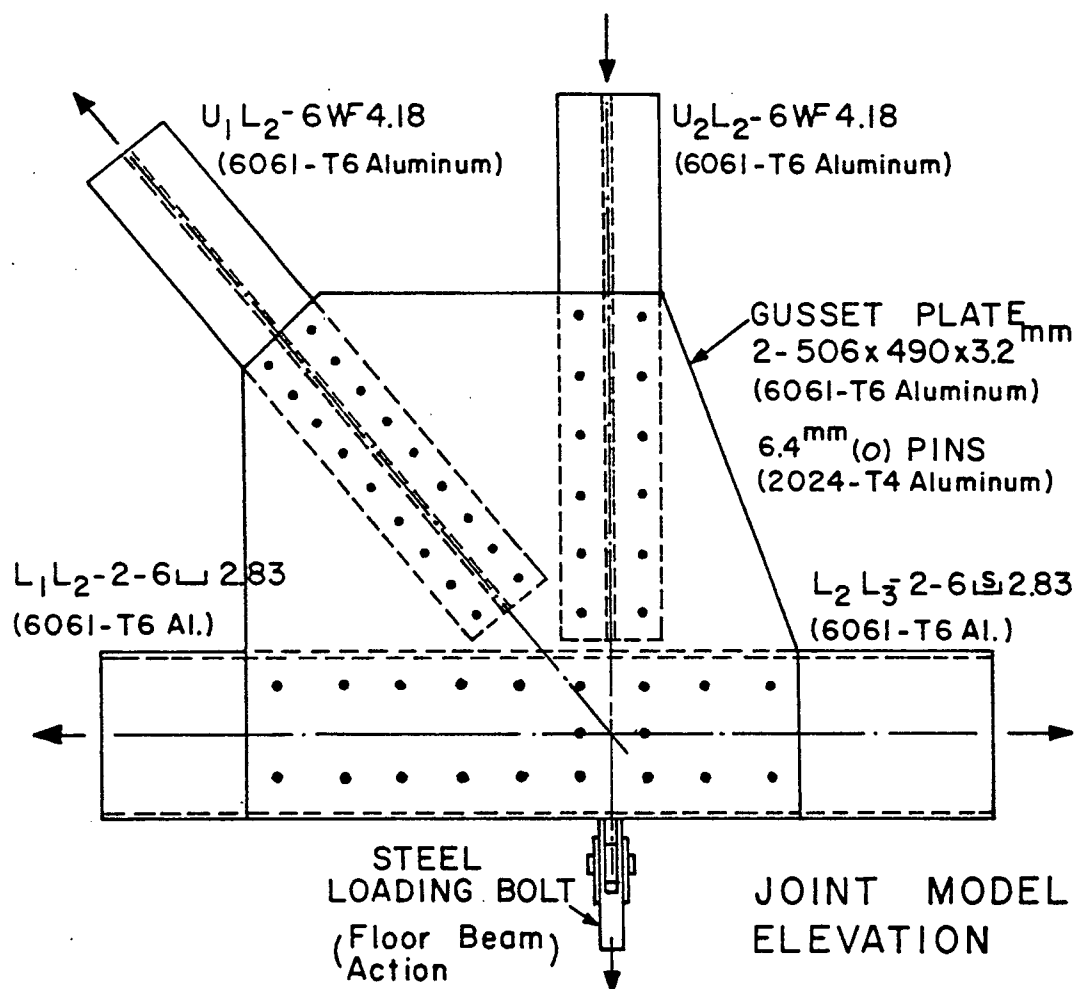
Pratt Truss Joint Tested by Irvan [44]
